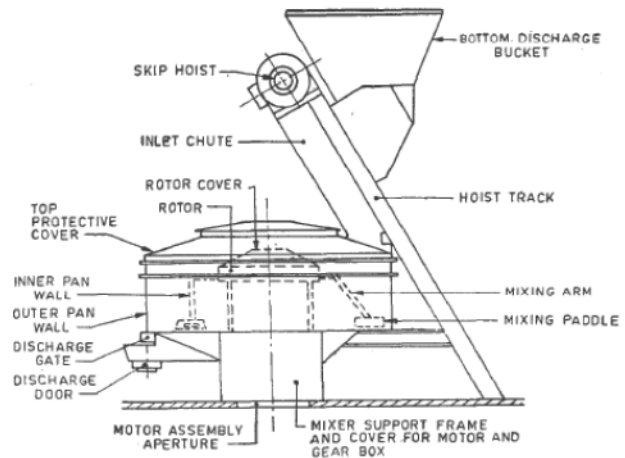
TYPICAL PAN TYPE CONCRETE MIXER
